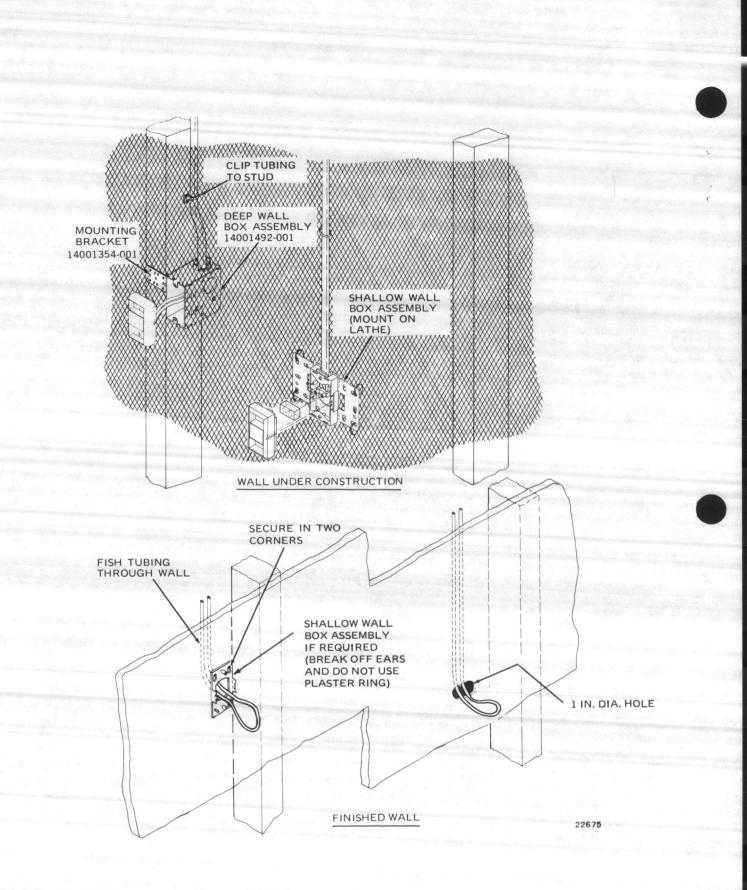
Fittings Used on Wood or Metal Studs Covered by Wire Lath and Plaster.
